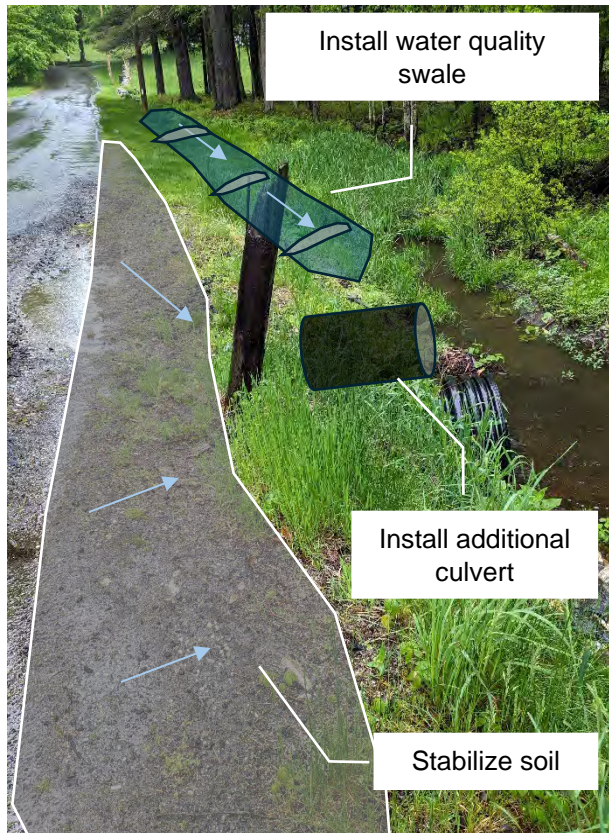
Erosion at the shoulder at the inlet for the culvert
